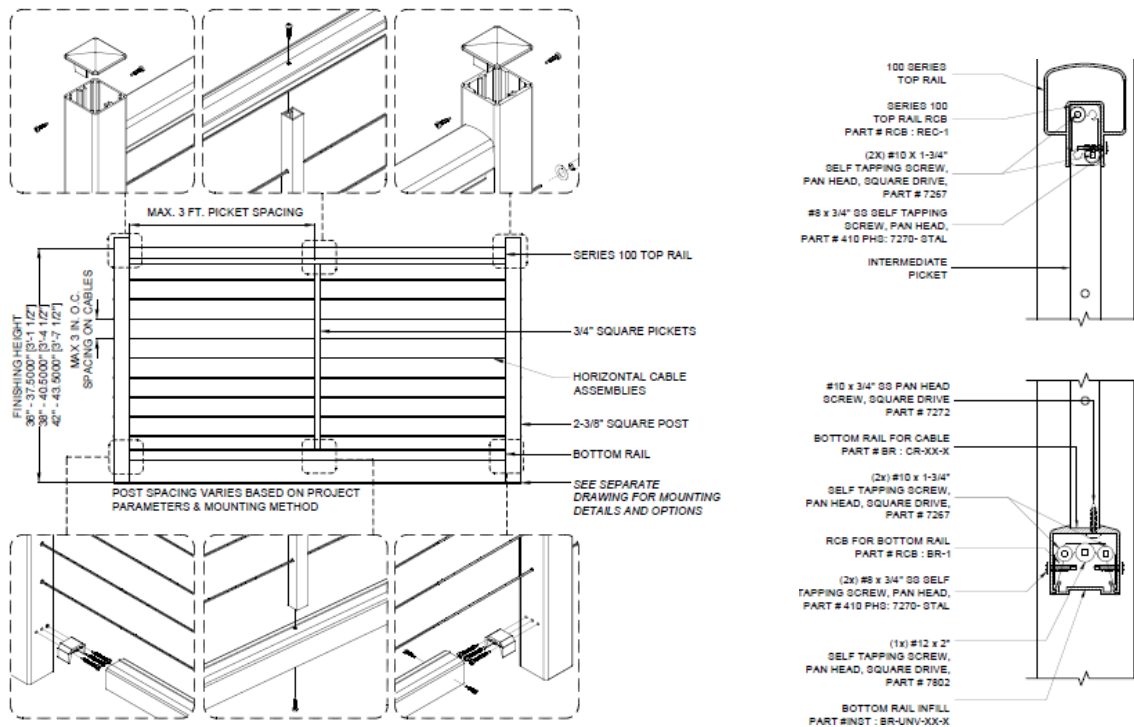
Series 100 and 150 Picket Infill Assembly (Series 100 shown)
